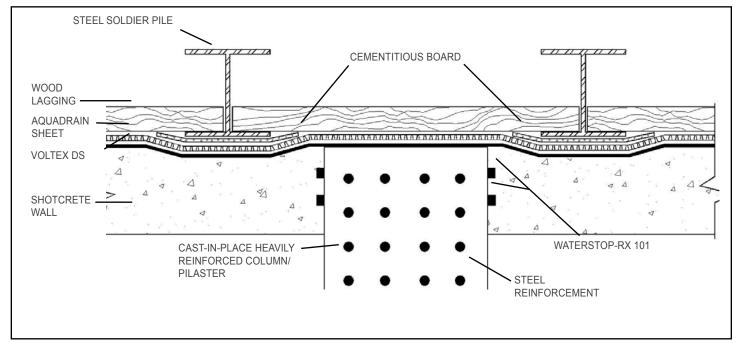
CAST-IN-PLACE STRUCTURAL COLUMNS AND PILASTERS
